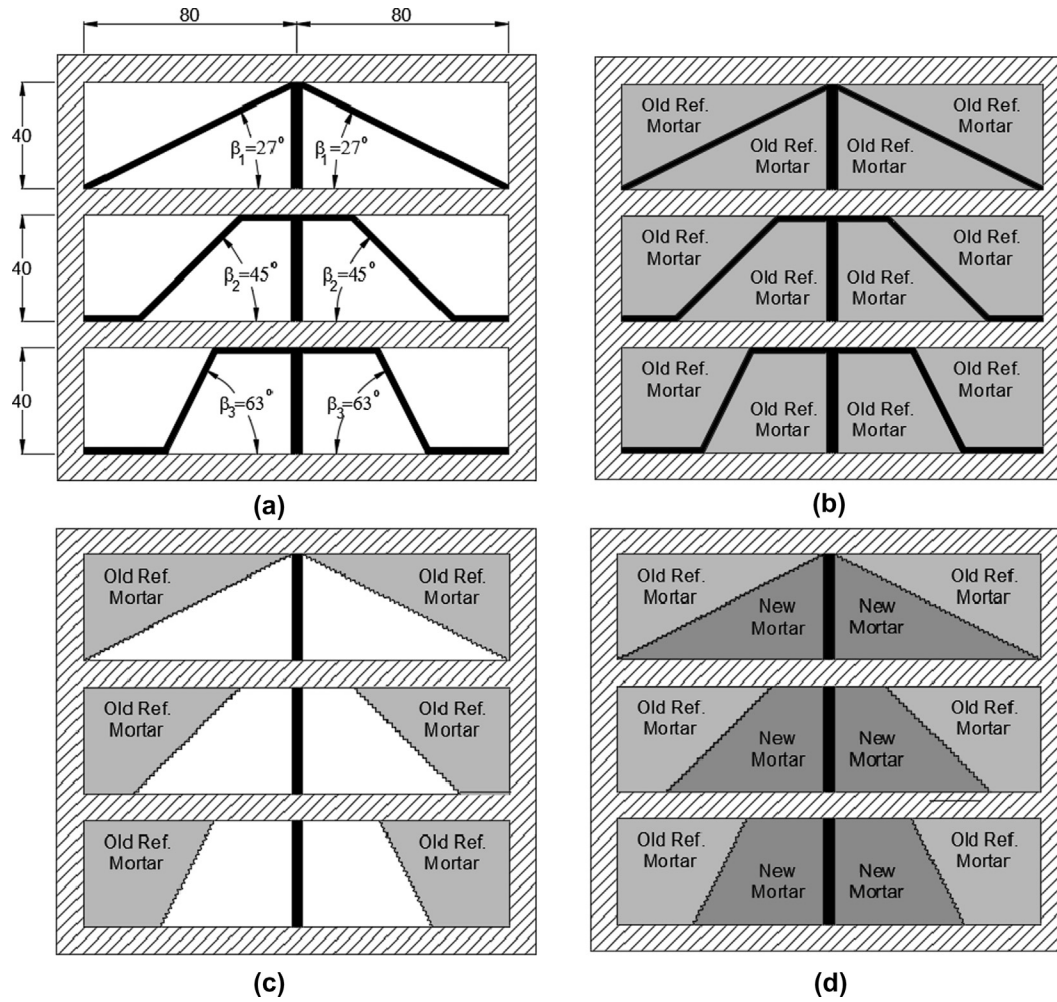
Making process of the bonded specimens: (a) mould prepared for the making of the first halves; (b) reference old mortar halves casted prior to be demoulded; (c) reference old mortar disposition on the moulds to be bonded to the new mortar halves; and (d) final specimens before being removed. (Figure dimensions in mm).
